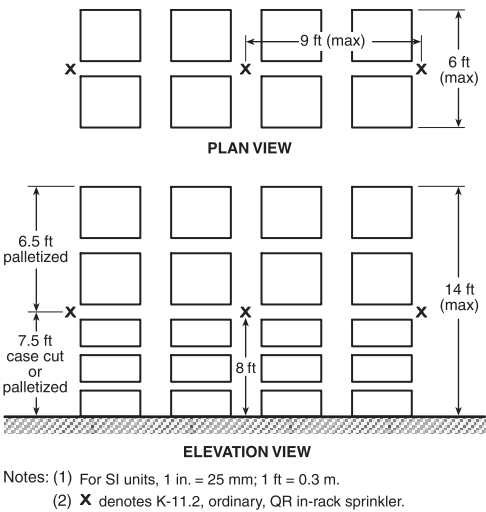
(a) Double-Row Rack Sprinkler Layout 7.
